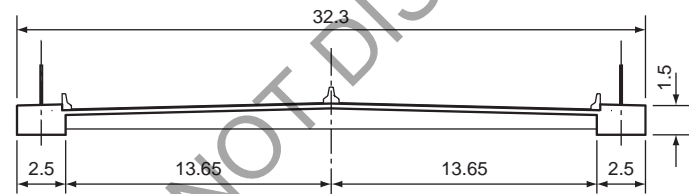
Twin beam concrete deck – Dames Point Bridge, USA (all dimensions in metres)
